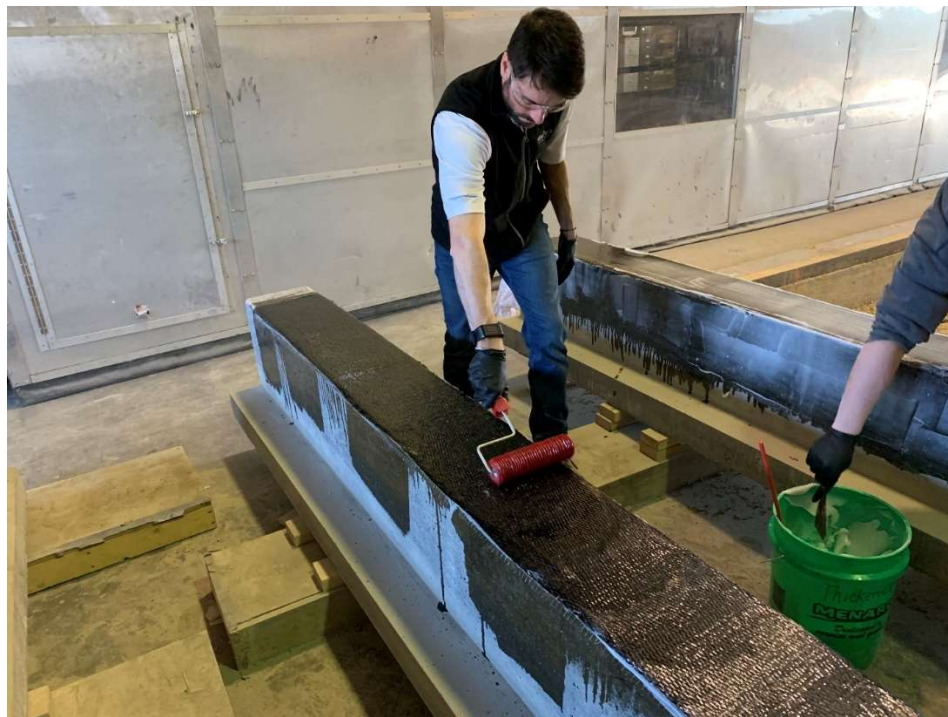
Rolling out the Carbon FRP Sheet with Rib Roller
